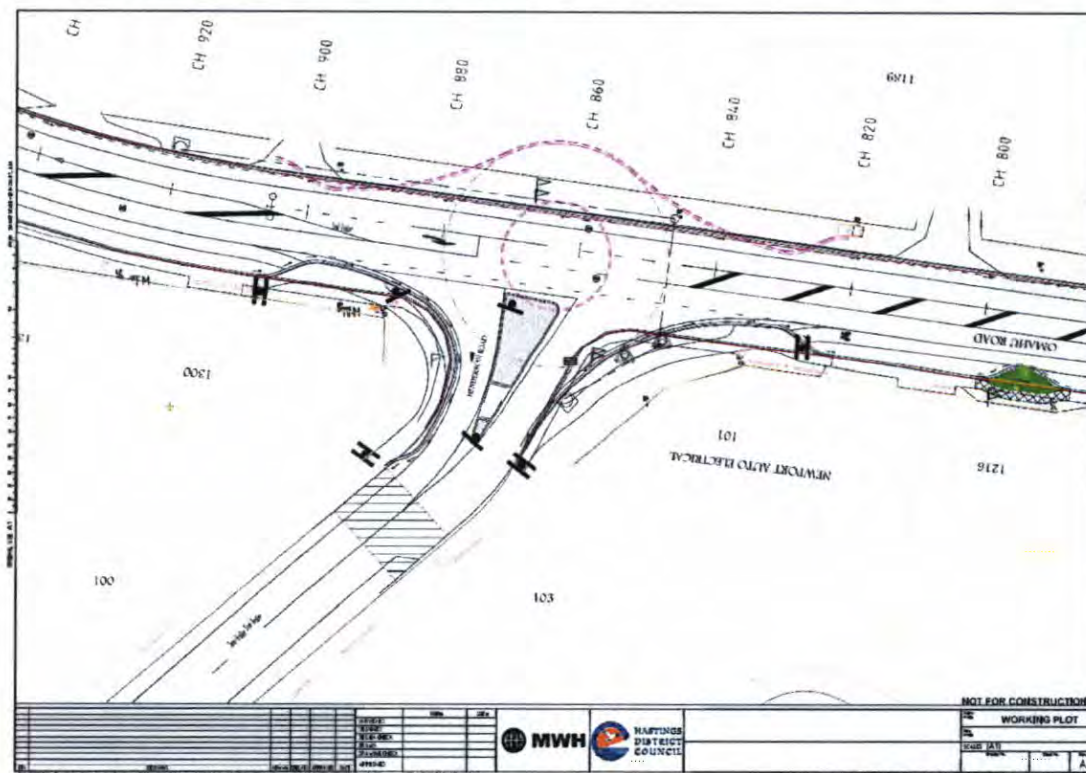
The Roundabout proposed at the Henderson Road / Omaha Road intersection
